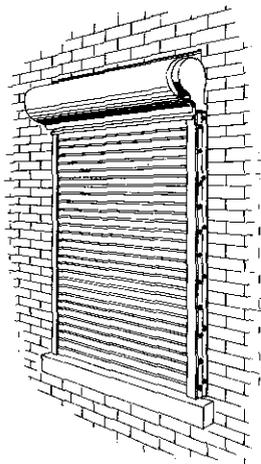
Exterior Mounted Automatic Rolling Fire Shutter
